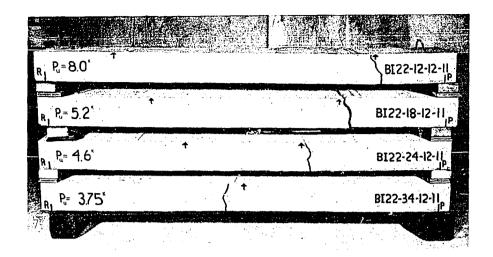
Fig. B.l. Typical shear-bond failures of beams constructed with deck I-22 gage. Each beam was 12 inches wide and 6 feet in length
